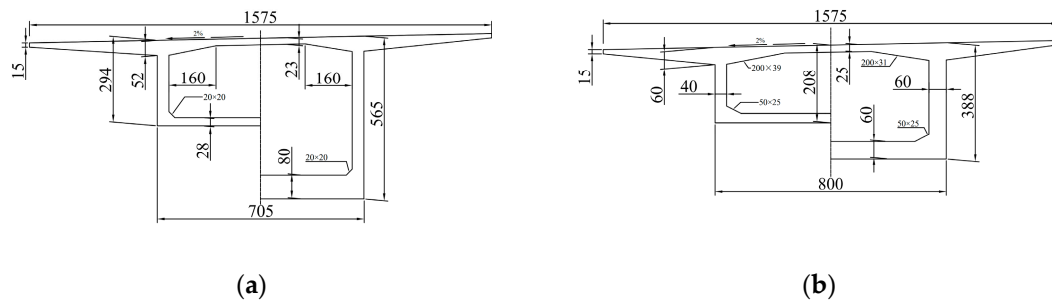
Design cross-section layout (unit: cm). (a) Bridge A, (b) Bridge B.
